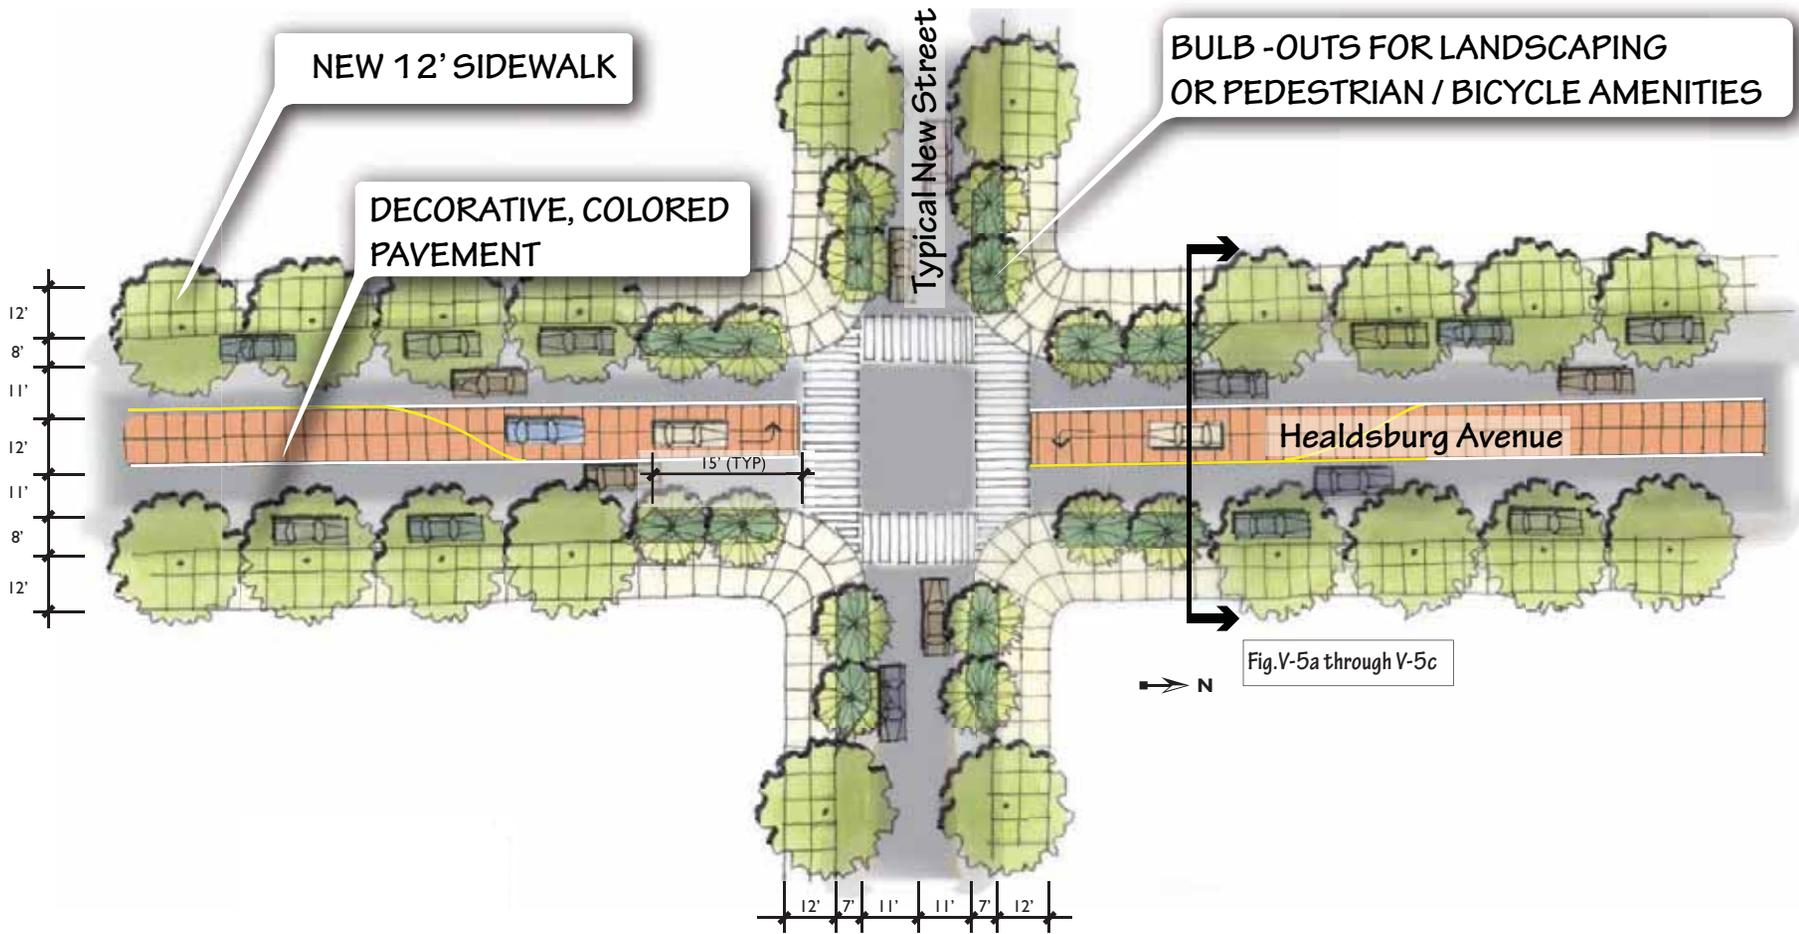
Plan view of a typical intersection where new street meets Healdsburg Avenue
